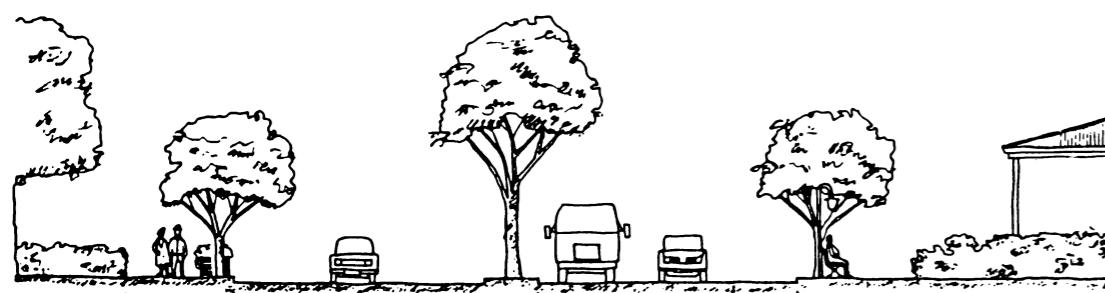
DETAIL OF TYPICAL FOOTPATH SEATING AREAS 1:100
